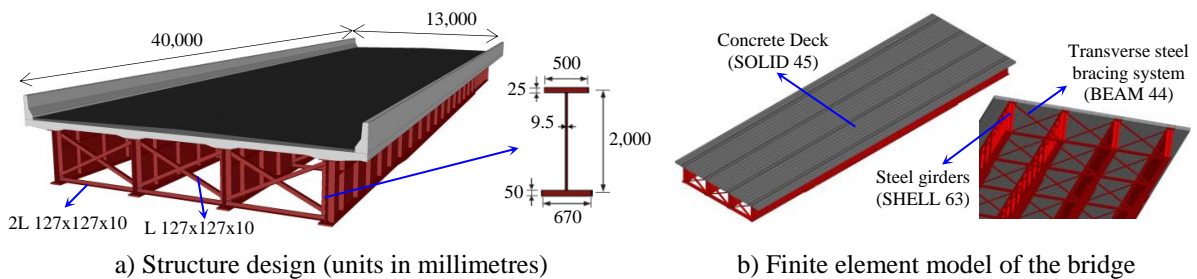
Investigated simply supported steel-concrete highway bridge deck
